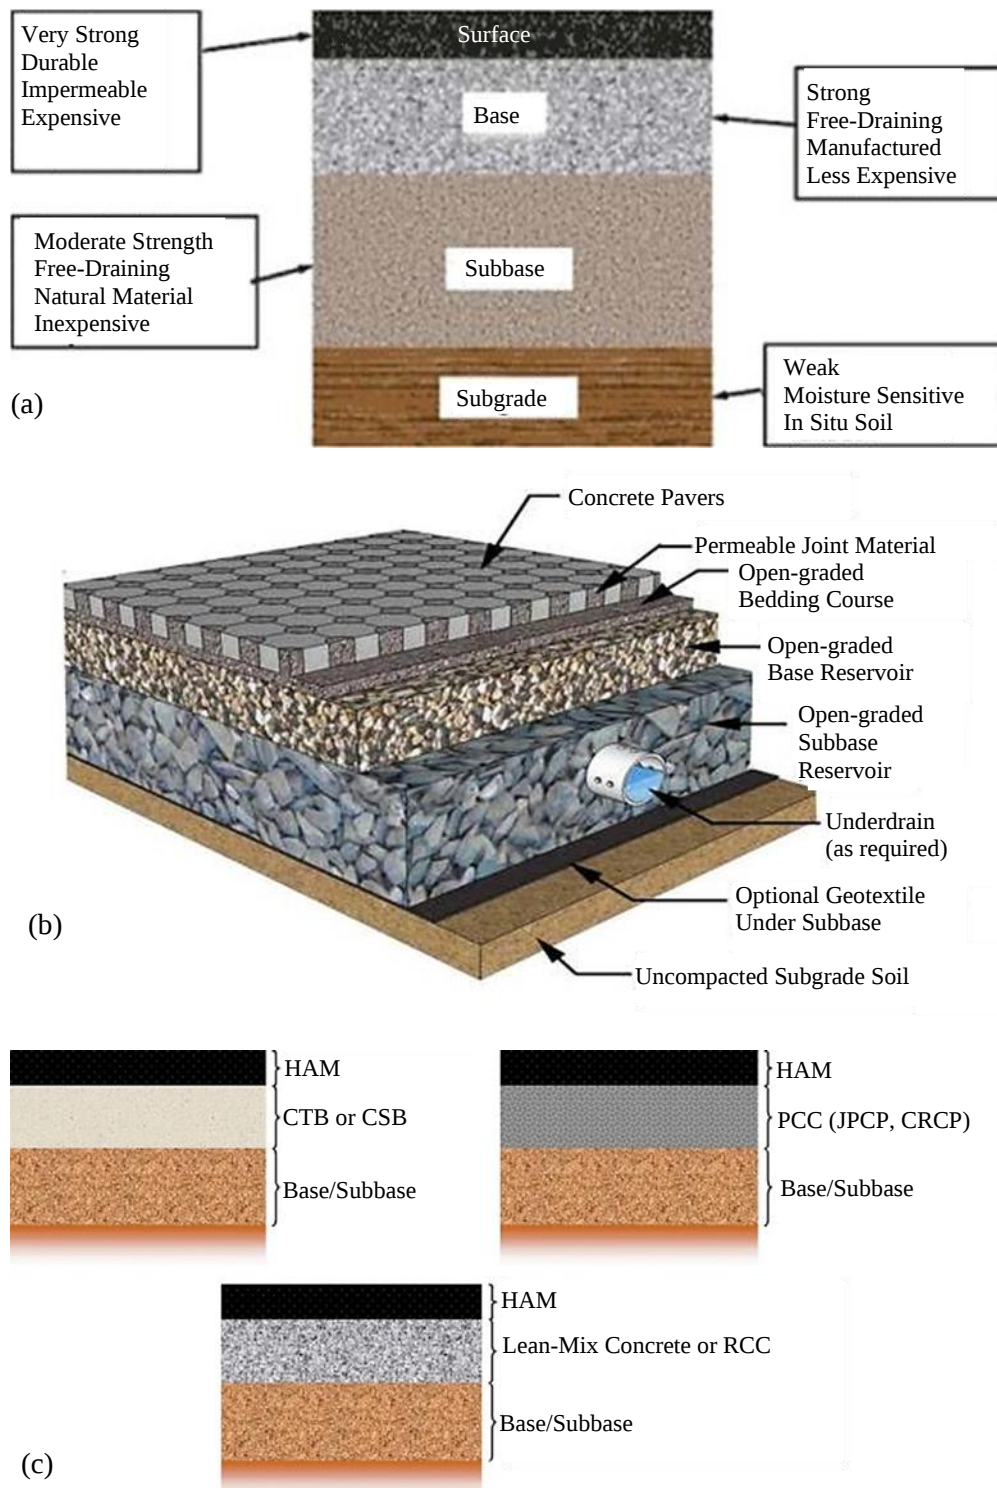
(a). Deep strength composite pavement. (b) Subsurface draining permeable pavement (c) Typical cross sections of composite pavement systems.
